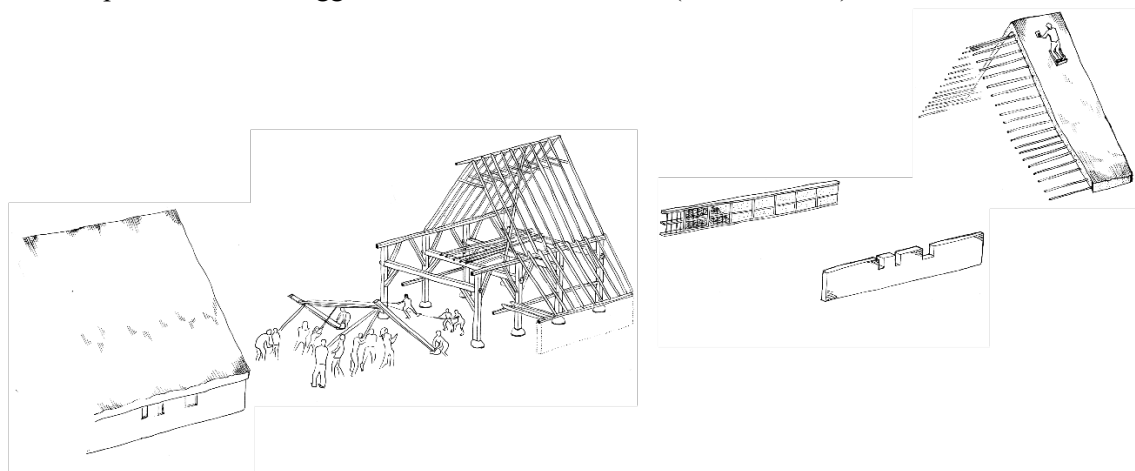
Building method of the hallenhuis from left to right: finished farm, anchor beam trusses and secondary roof structure, self-bearing wickerwork or brick walls and thatching of the roof. Own work.
